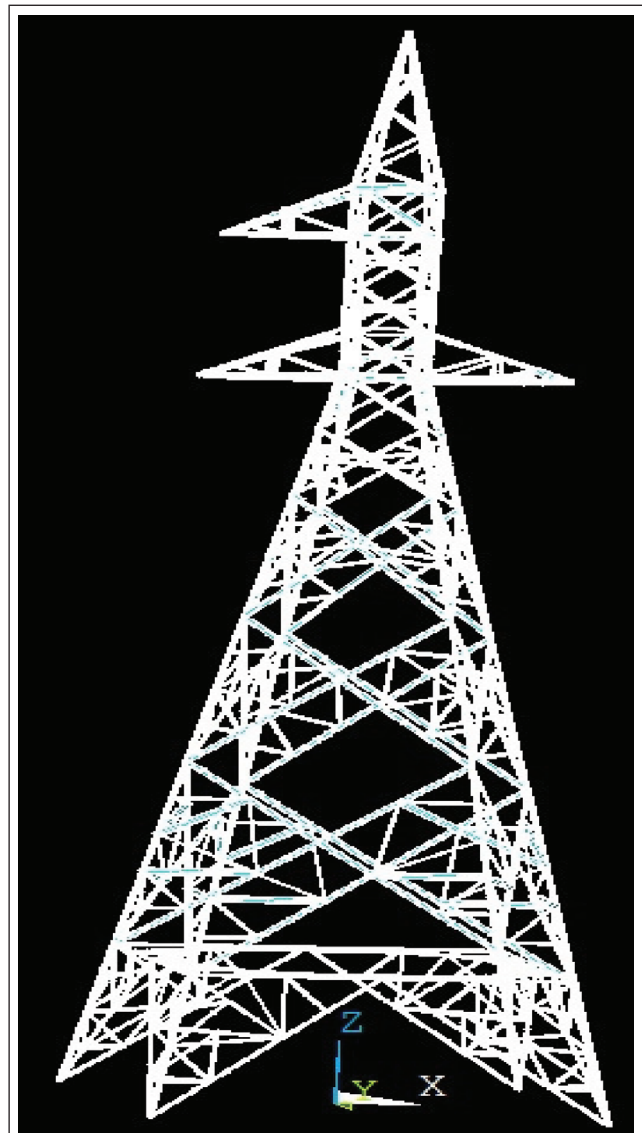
TOWER MODEL WITH CHS SECTION FOR CROSS ARM AND BRACINGS
